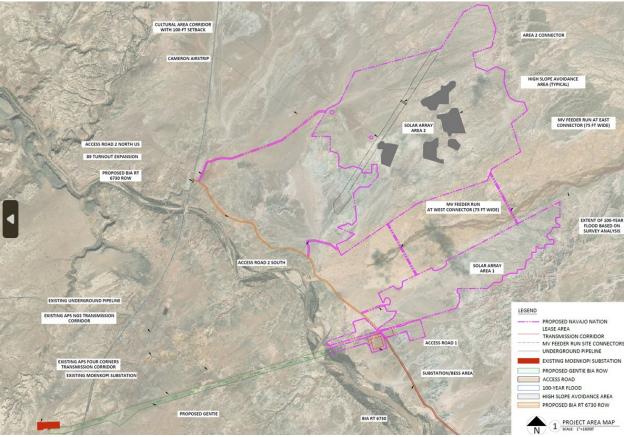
Proposed Solar Generating Facility Site Plan
